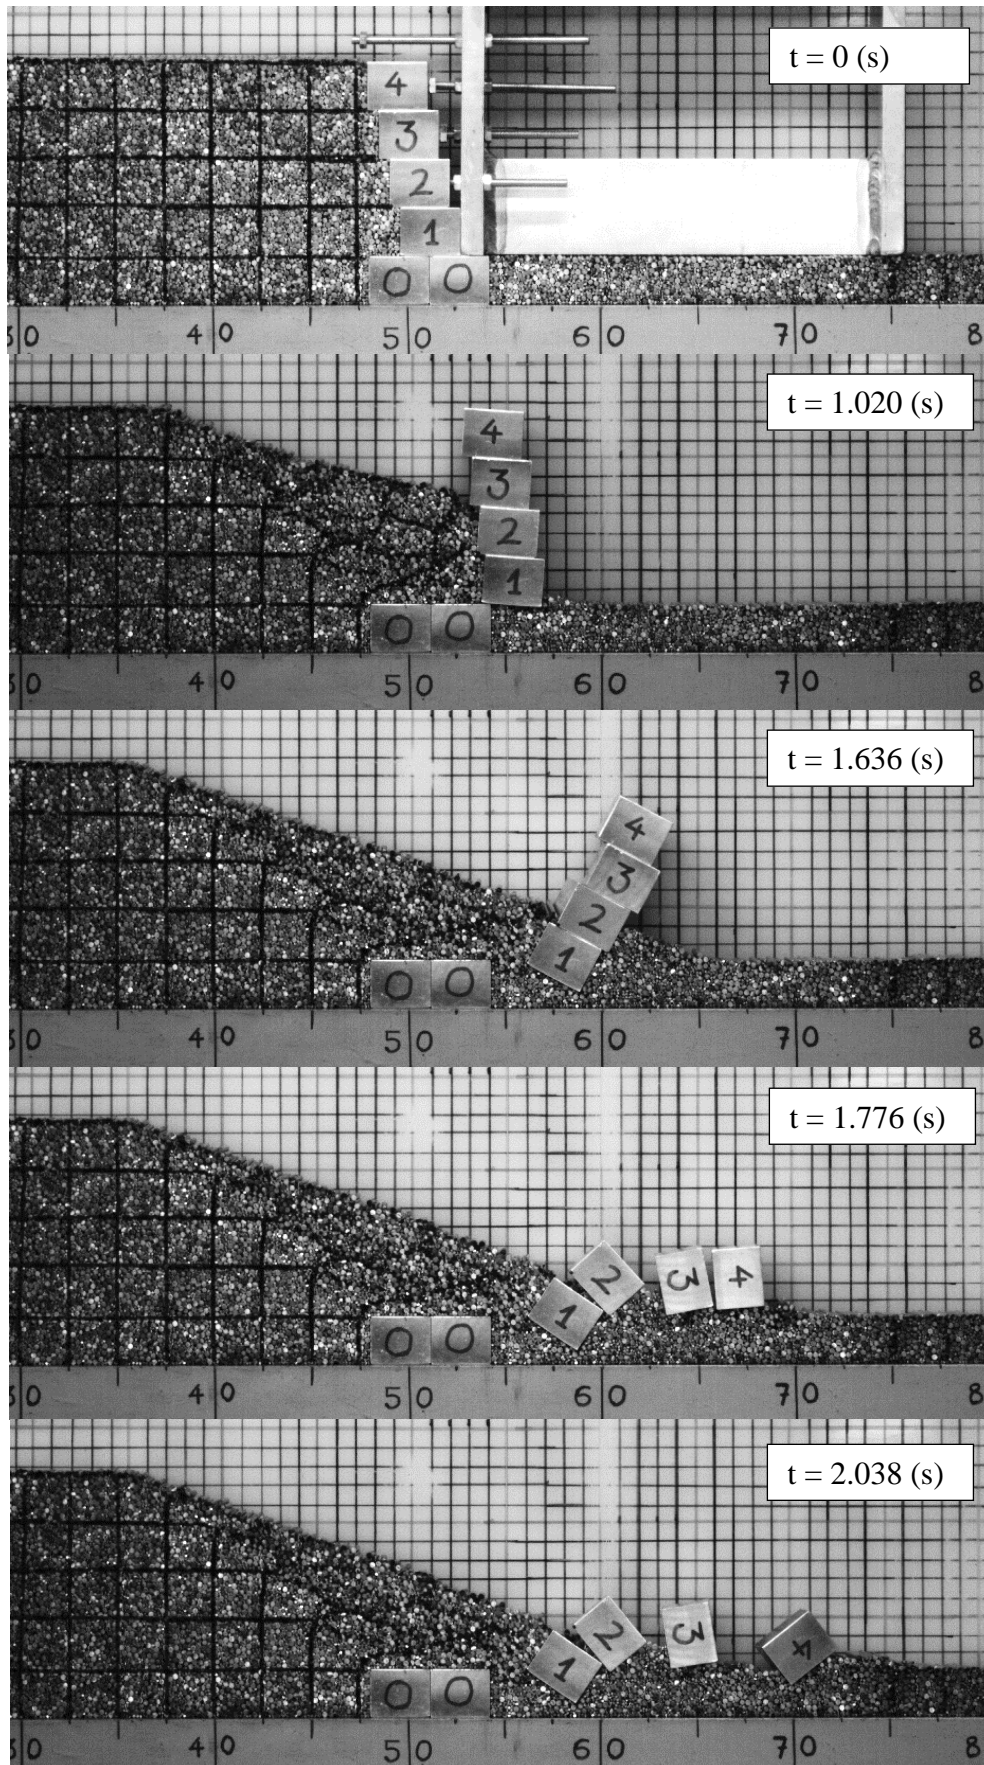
Post-failure behavior of modular-block retaining wall system. *Case 2
